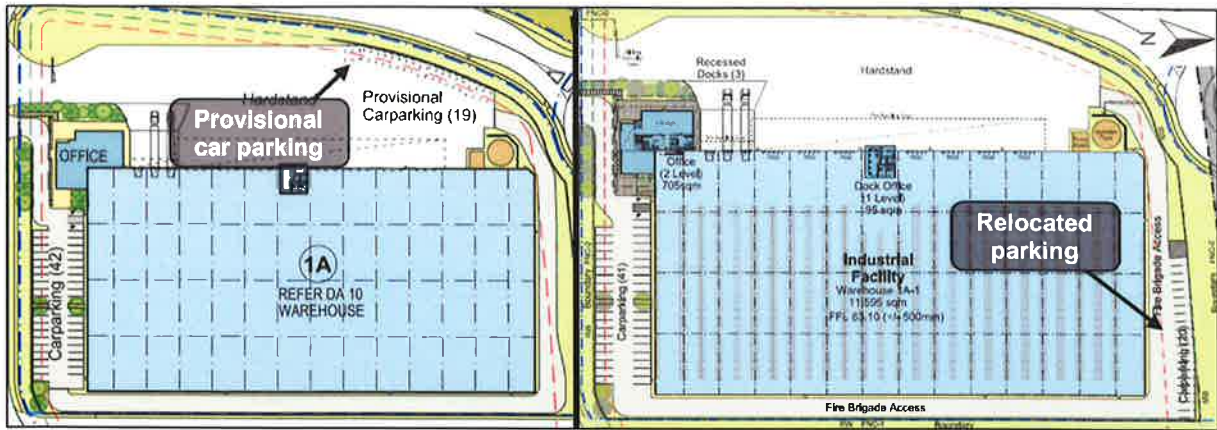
Proposed Car Parking at Lot 1A (left) and Amended Car Parking (right)
